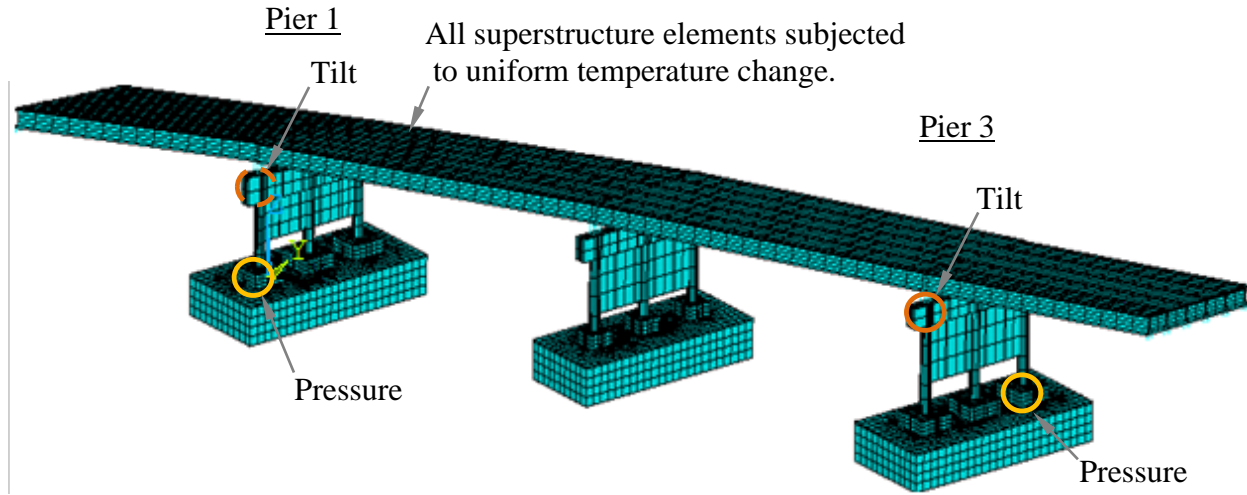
Locations of interest throughout the finite element model of the New Trammel Creek Bridge.
